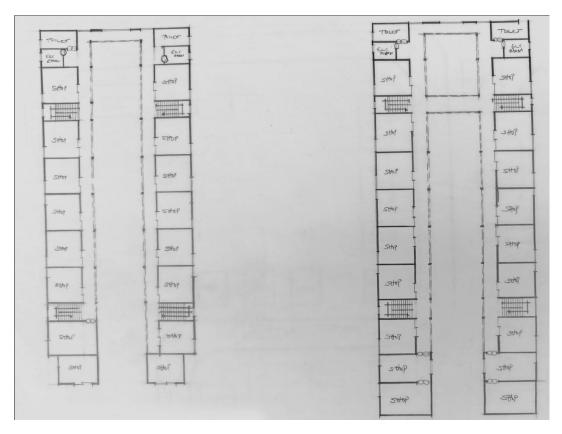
SITE PLAN OF CASE STUDY THREE
